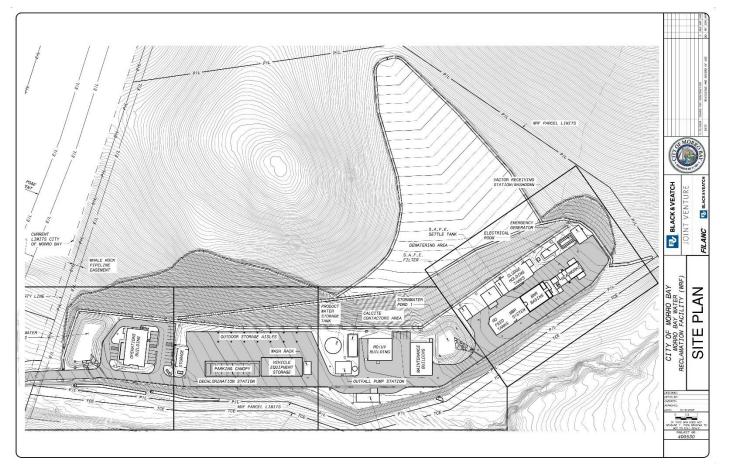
Morro Bay Water Reclamation Facility Site Plan
